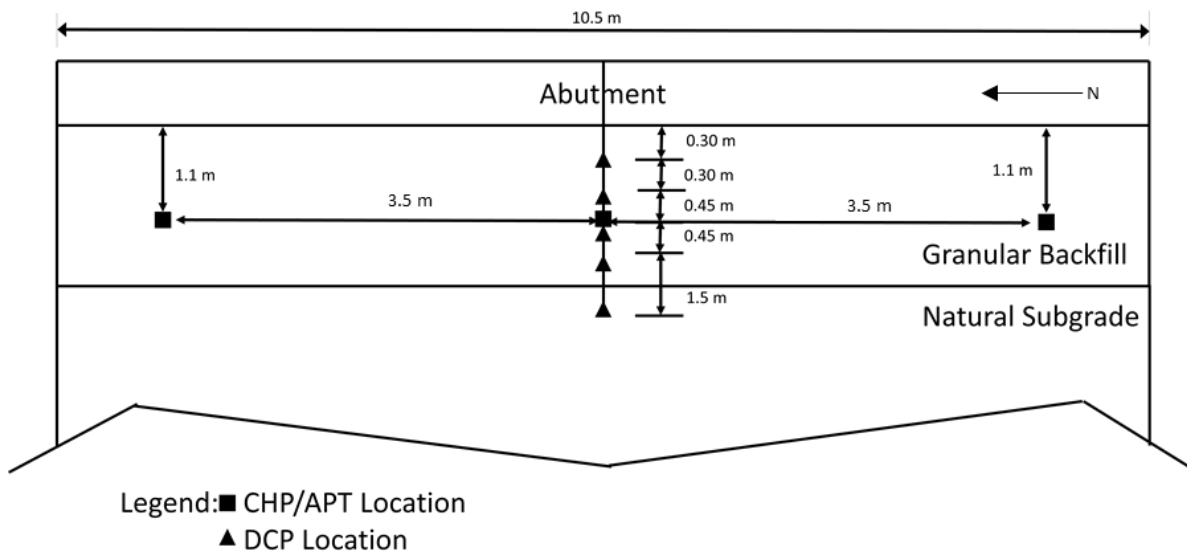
Plan view of the bridge abutment showing APT, CHP, and DCP test locations at Slovak Valley Creek Bridge
